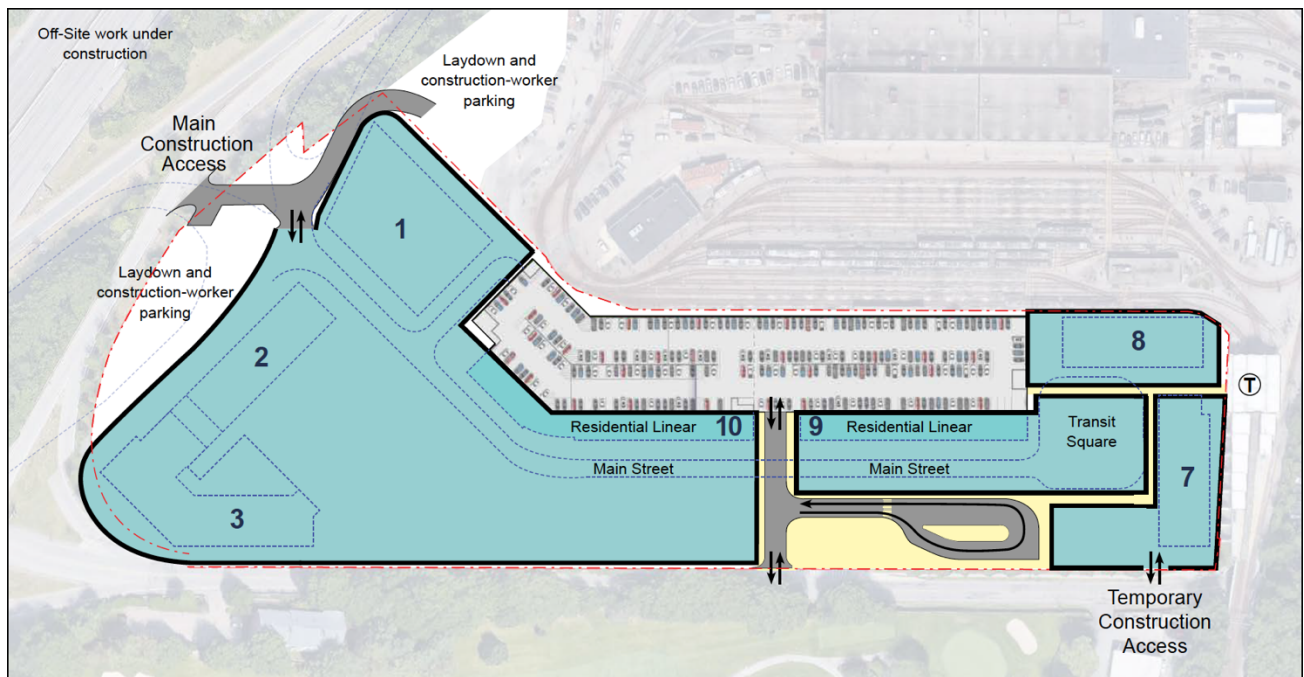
Garage Structure Temporary Access (Months 29-34)
